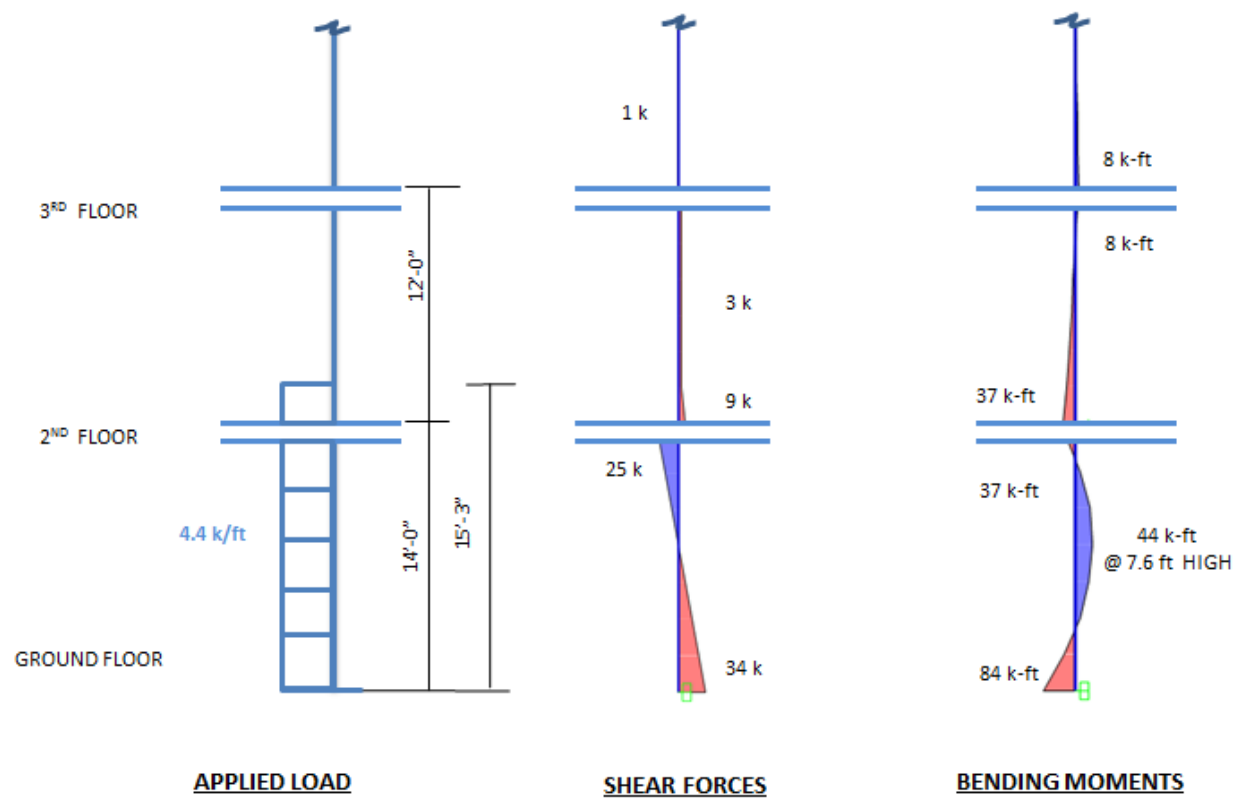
Hydrodynamic loading on interior column of Hilo office building due to Load Case 2
